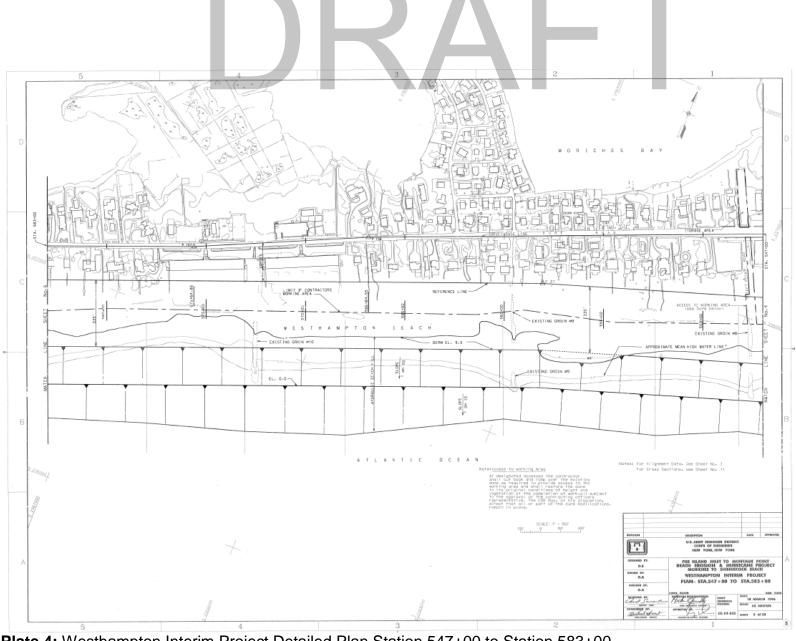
Westhampton Interim Project Detailed Plan Station 547+00 to Station 583+00
